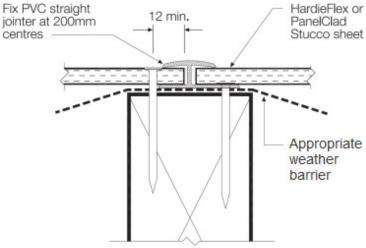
Sheet Joint on Timber Framing (steel framing similar) (thermal break may be required)
